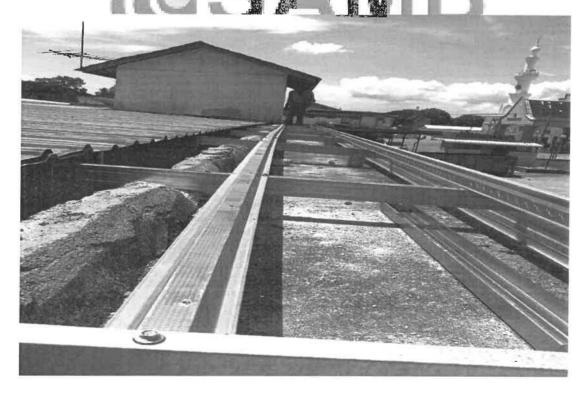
Plan view roof SAMB Masjid Tanah, Melaka
